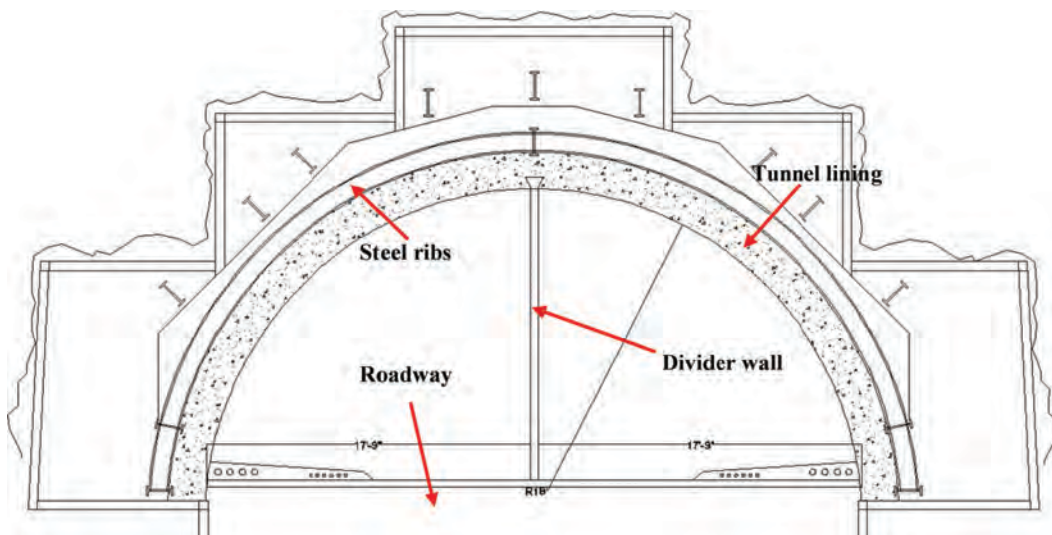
Eisenhower Memorial Tunnel plenum view.
